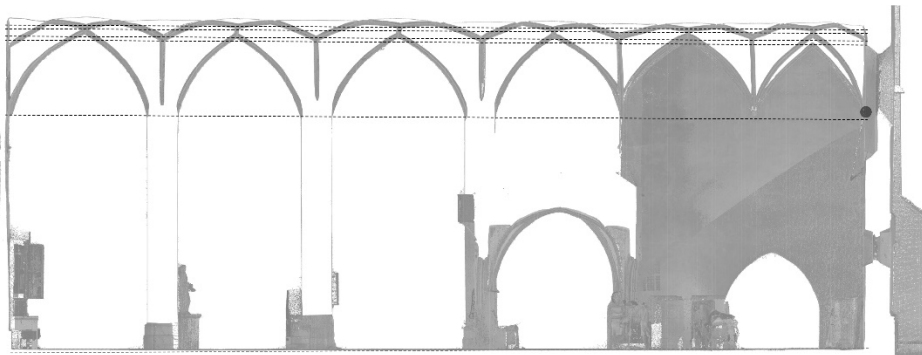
The examination of the vault system's longitudinal sections. The longitudinal sections of the northern aisle looking to the south. The authors' work
